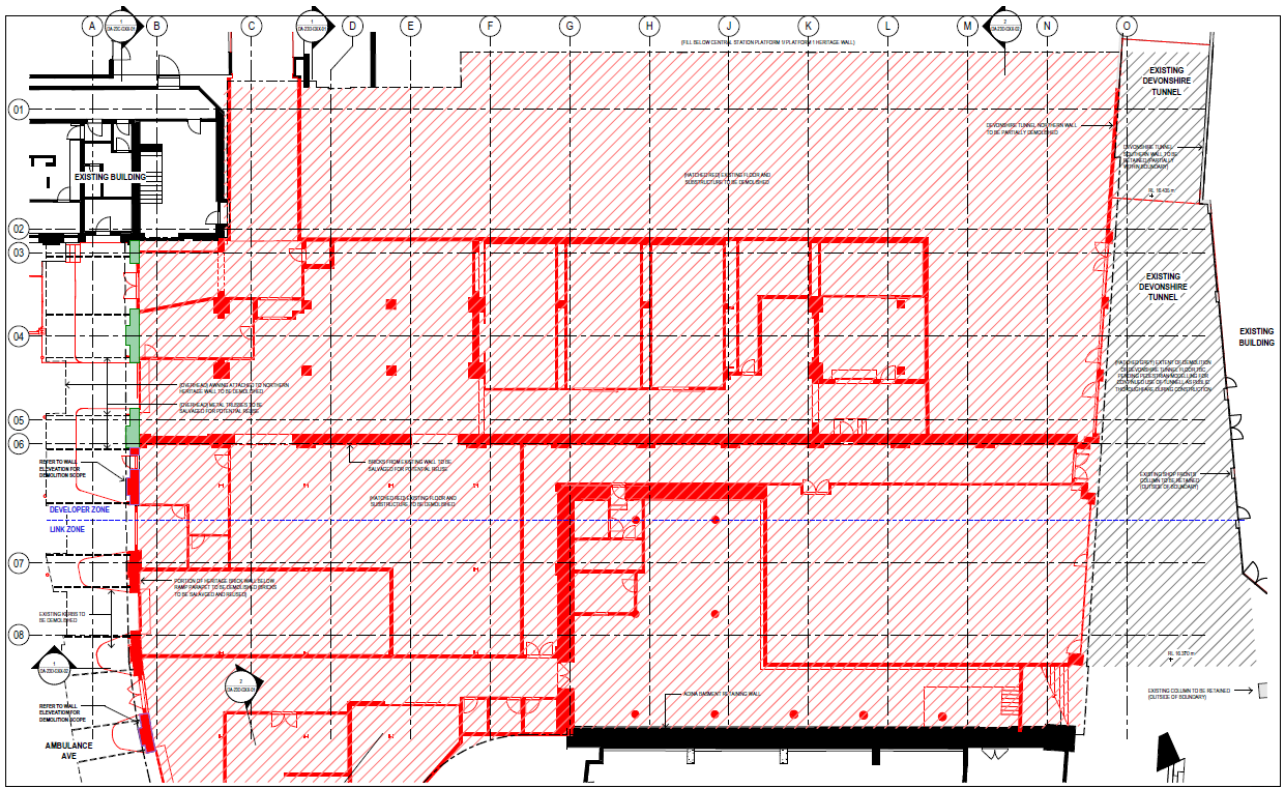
Extract of demolition and dismantling plan: lower ground floor part 1
